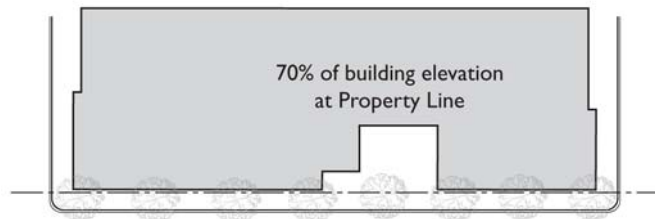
V-3 Building Bulk, Articulation, and Length
